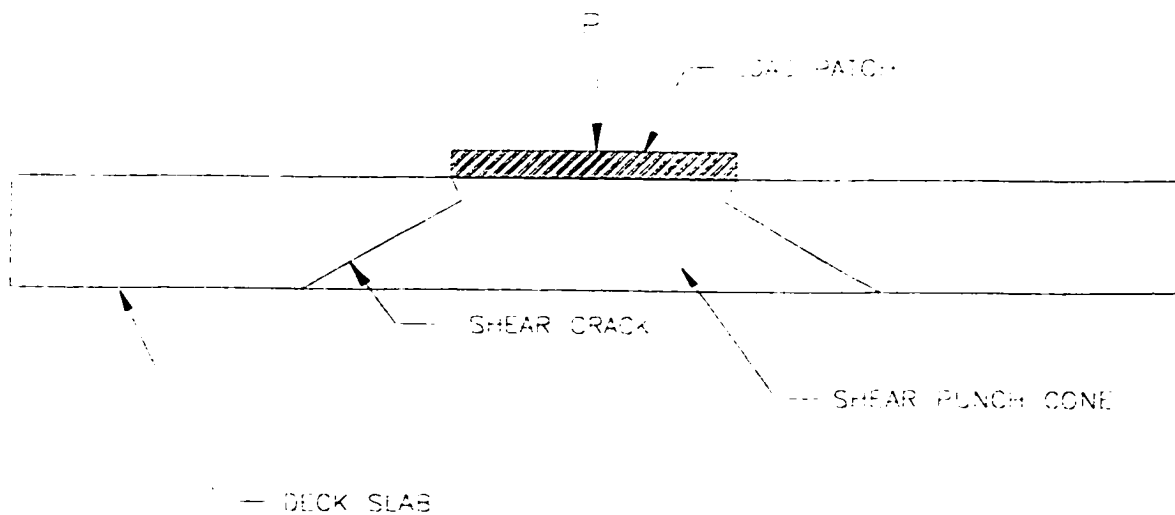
Cross-section of deck slab showing shear cracks and punch cone
